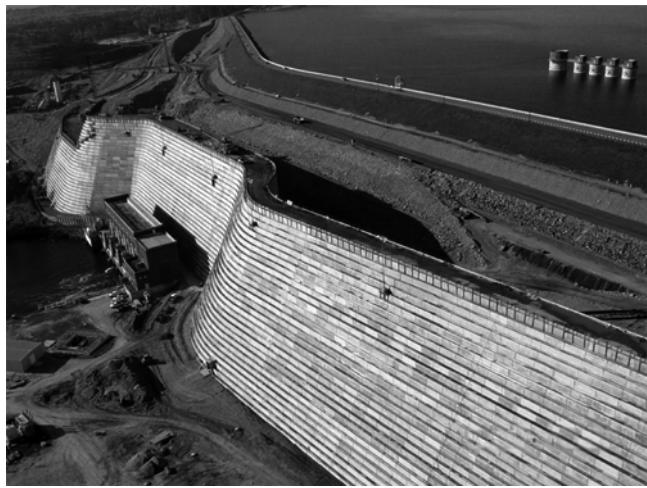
Precast concrete forms for vertical upstream and stair-step downstream faces of Sluda Replacement Dam, SC. (Photo courtesy of Barnard Construction, 2005.)
